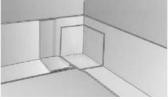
Corner and Joint terminations during TPO membrane installation
